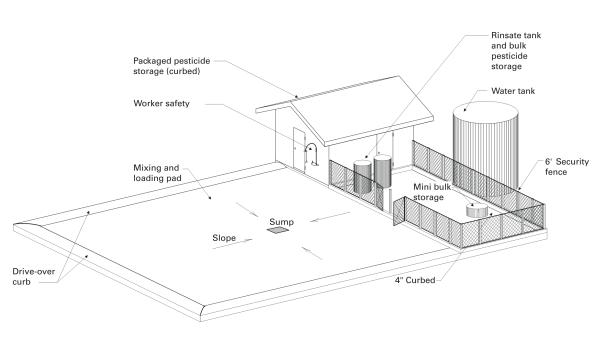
Small-scale facility, perspective view. Optional roof over entire facility.
